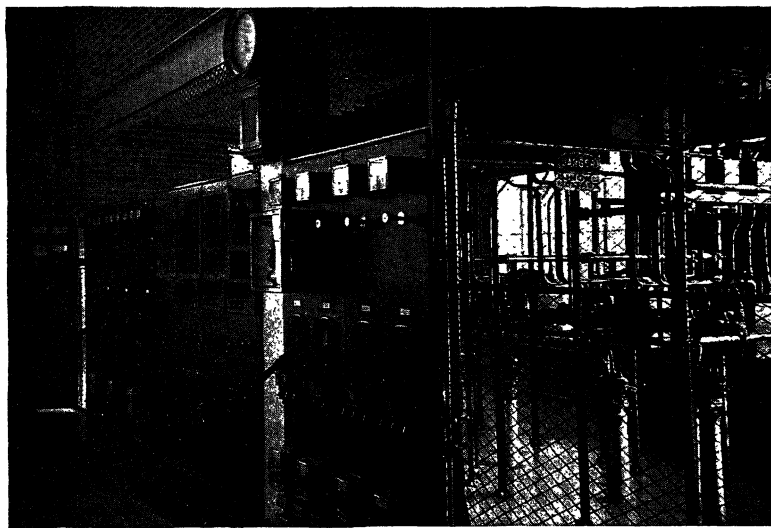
Conventional open-type switchboard. (*Courtesy of Burns & McDonnell Engineering Company.*)
